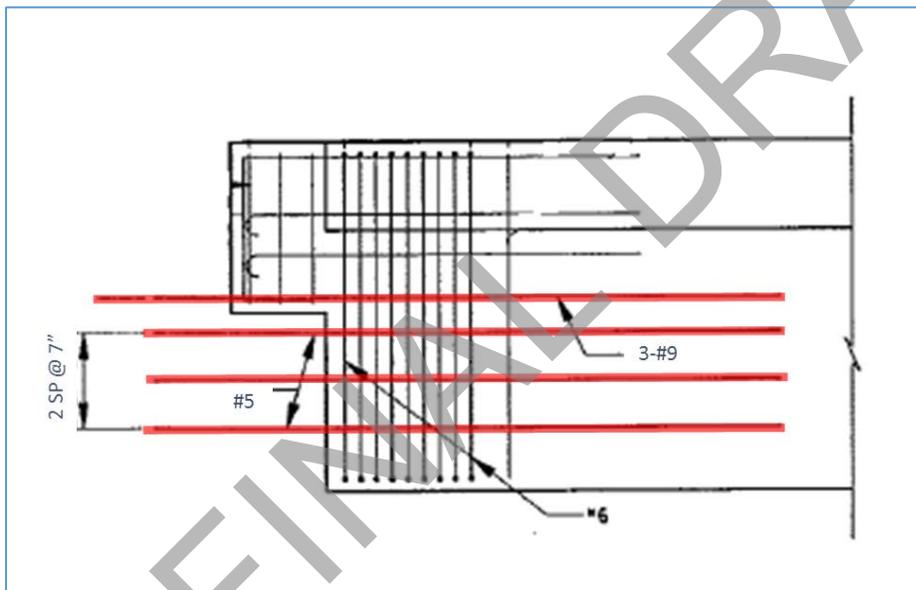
FIXED BEAM END (ELEVATION VIEW)
